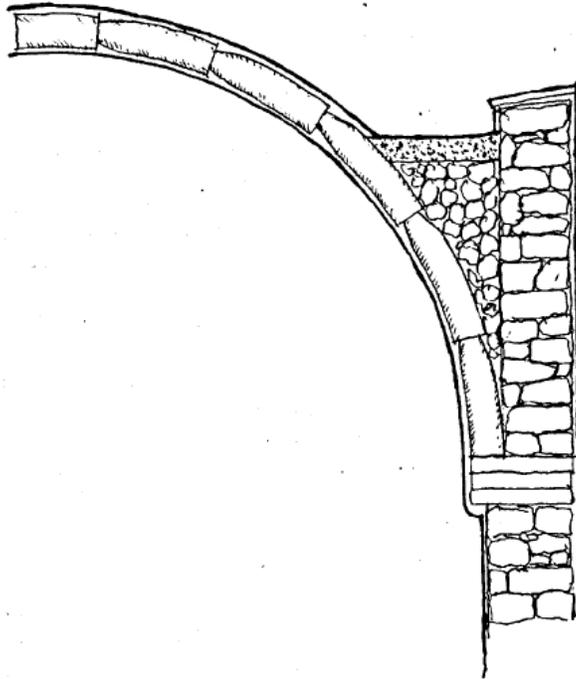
Vault and wall construction of Room 8, Morgantina North Baths.
